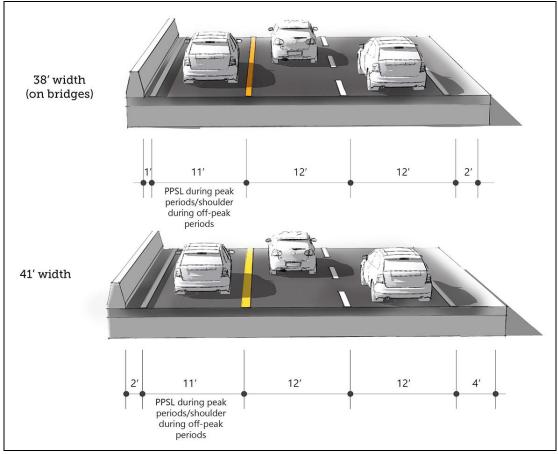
WB PPSL Proposed Action Typical Cross Sections
